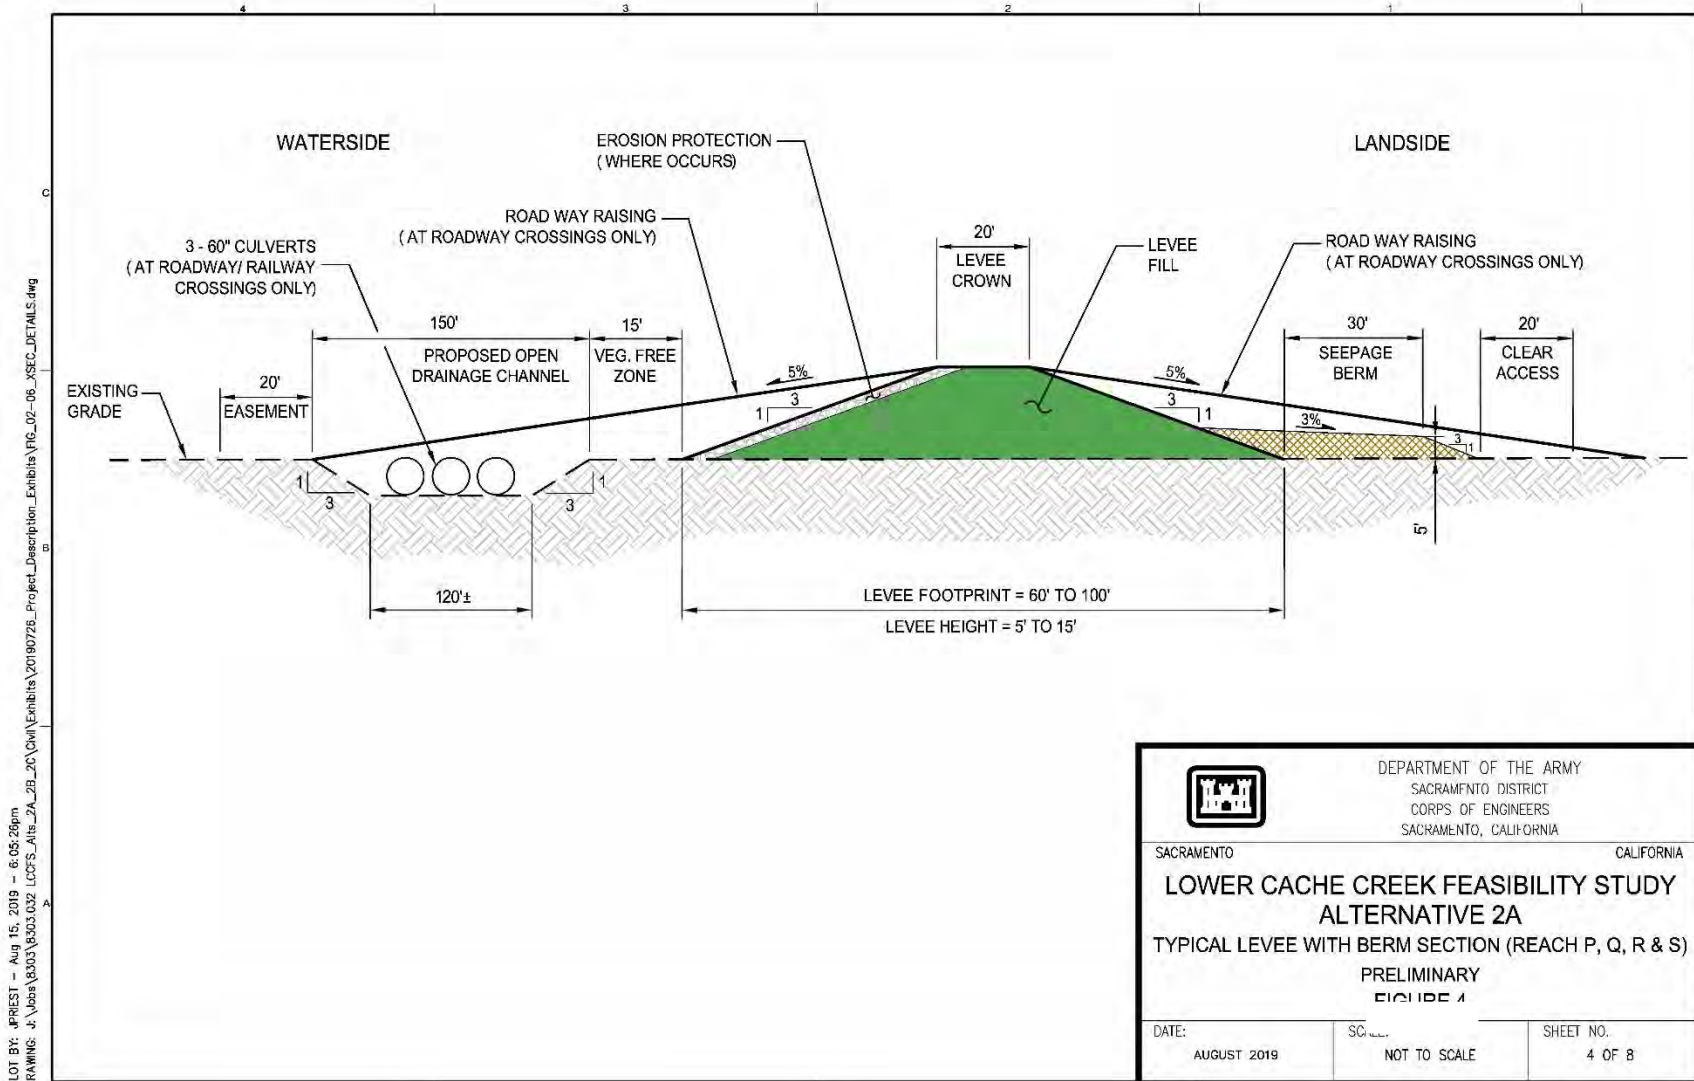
Typical Levee with Berm Section (Reach P, Q, R & S)
